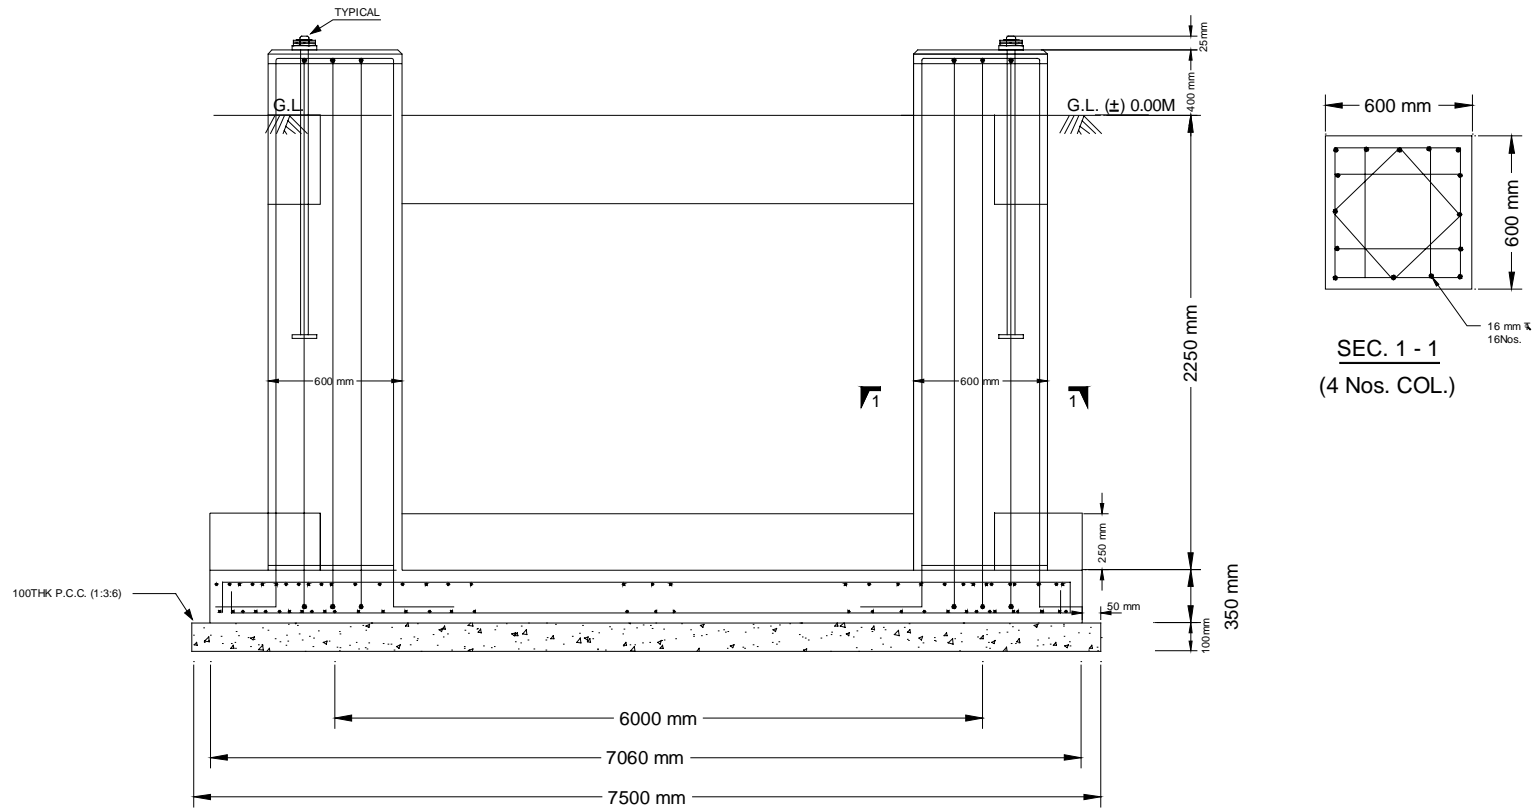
DETAILS OF FOUNDATION FOR WIND SPEED 160 KMPH.
